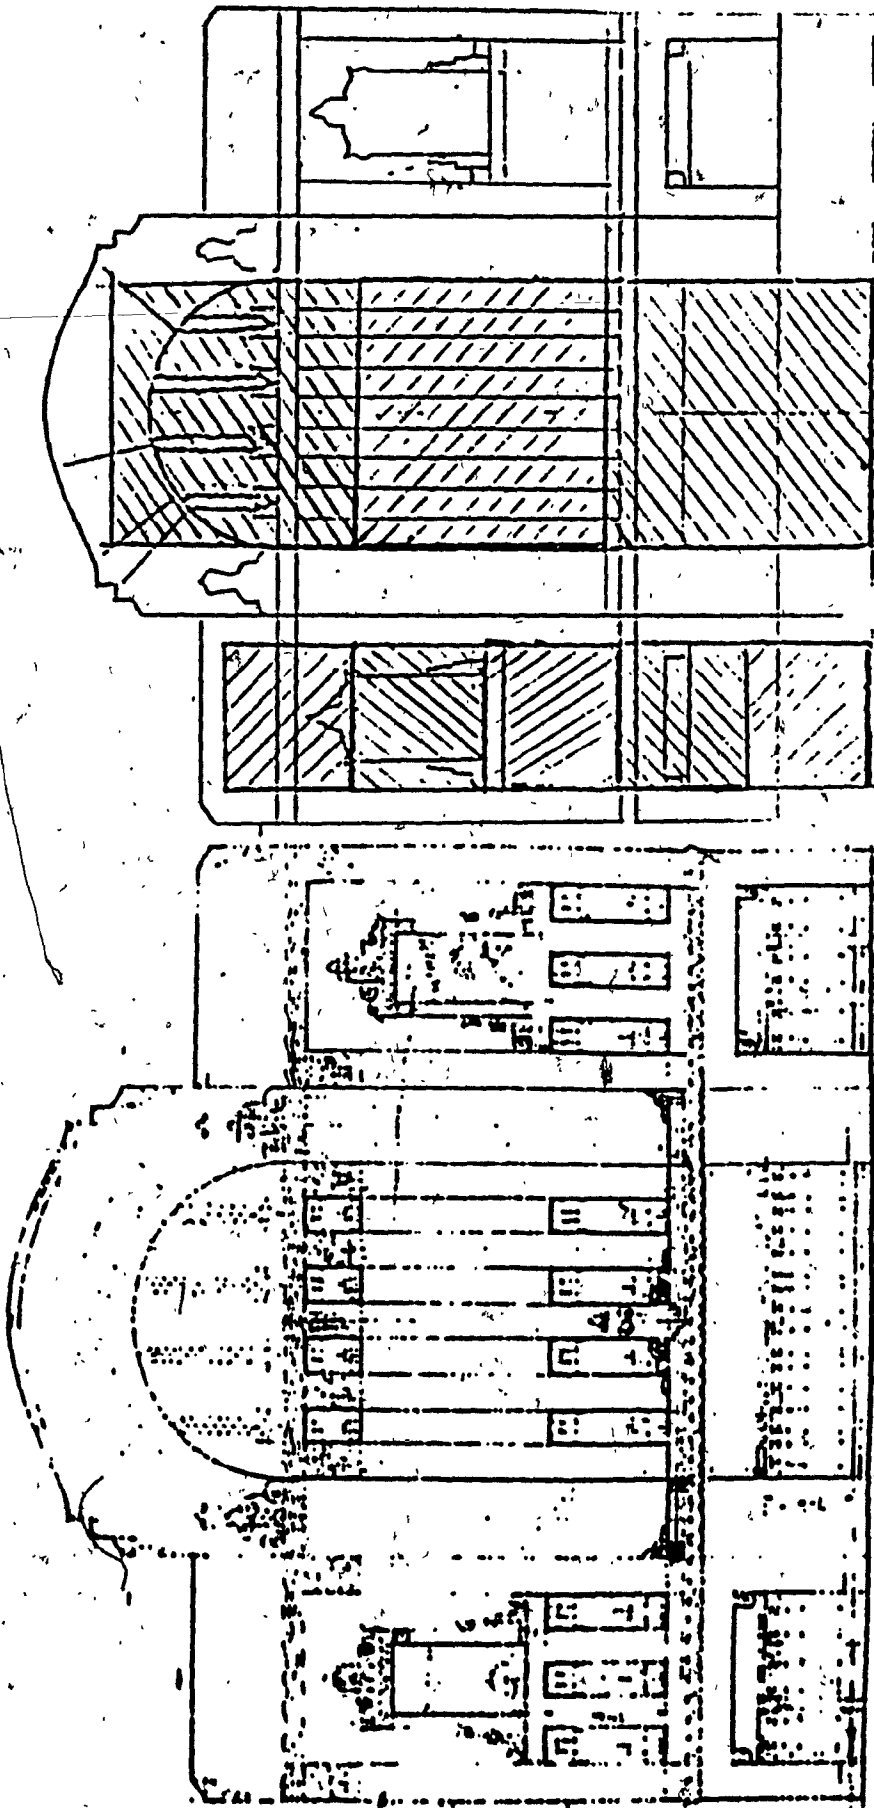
LE CHATEAU: Main facade (front elevation); C.M.A. Architectural plans #440-1931. Scale: 1/8 in = 1 ft (.32 cm = .31 m).
